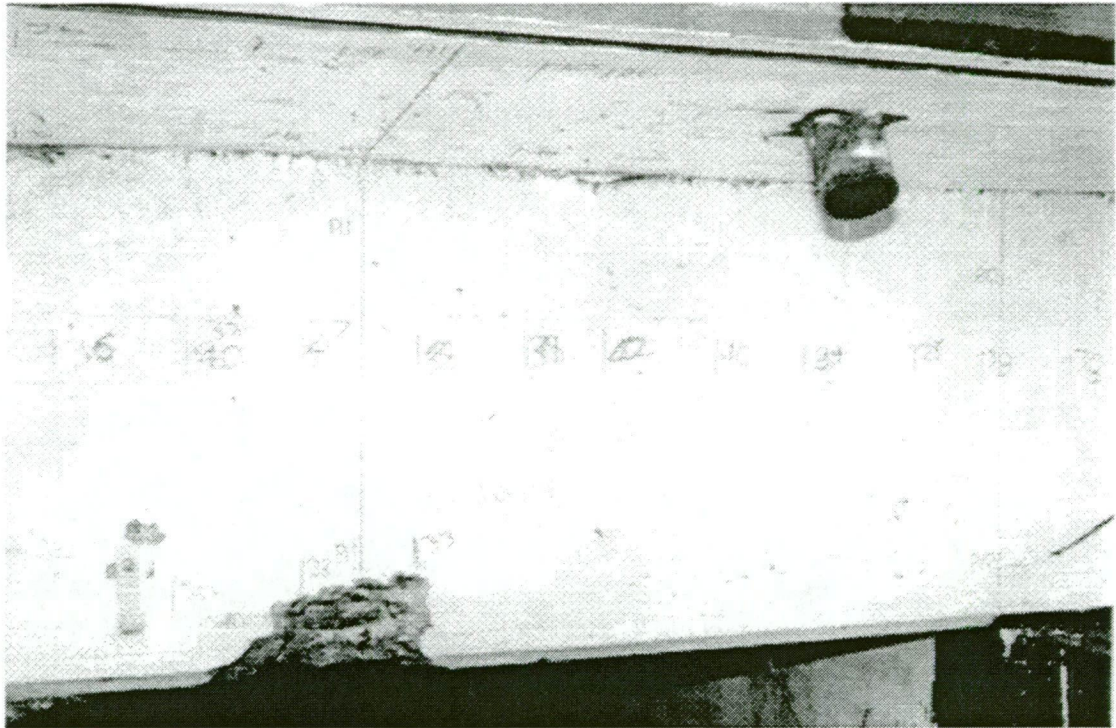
Covers on Exterior Beam and Deck Soffit
